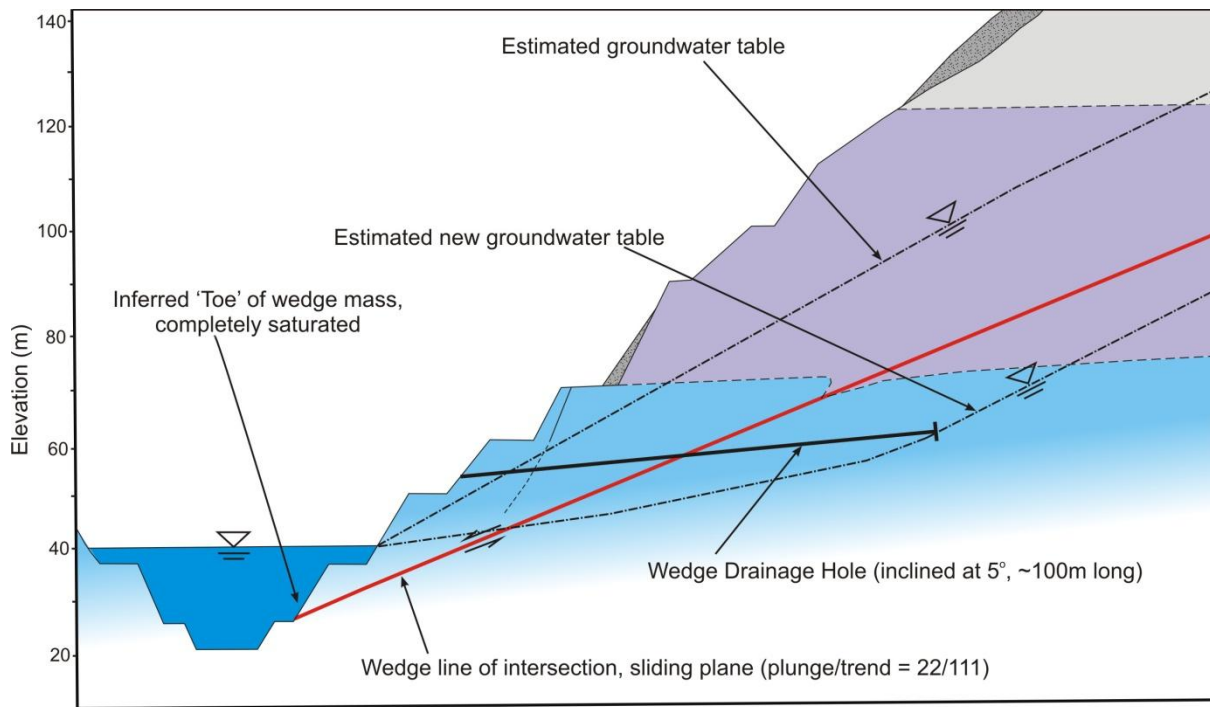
Cross-section showing inclination and length of wedge drainage holes.
